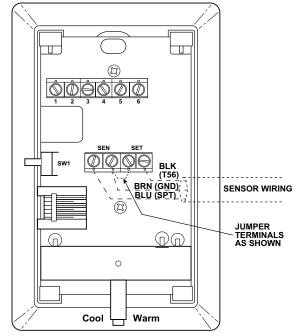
Space Temperature Sensor Typical Wiring (33ZCT56SPT)
